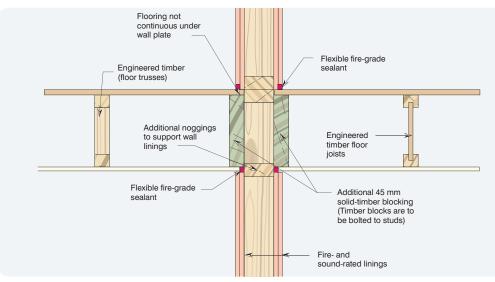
Joist parallel to wall, single wall studs continuous through junction with timber blocks – FRL 60 minutes – elevation view.
